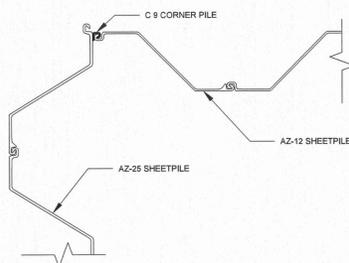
INTERIOR CORNER DETAIL (TYP)
